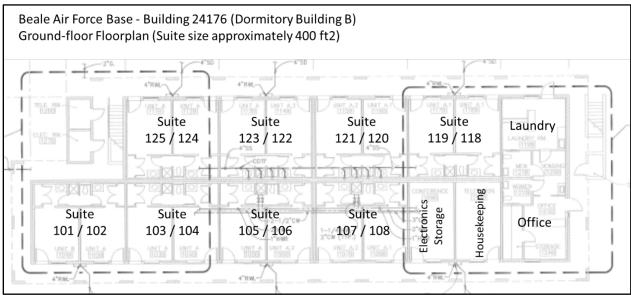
Beale Air Force Base Building 24176 (Dormitory Building B) Ground-floor Floorplan.
